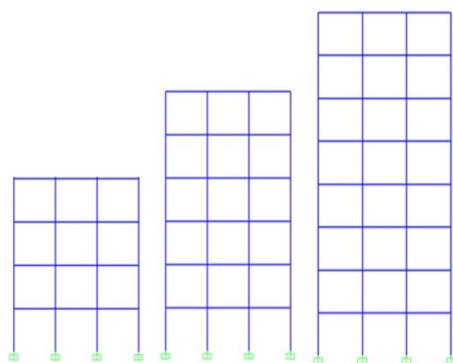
2D SAP2000 model for fixed supported 4, 6, and 8 storied buildings
